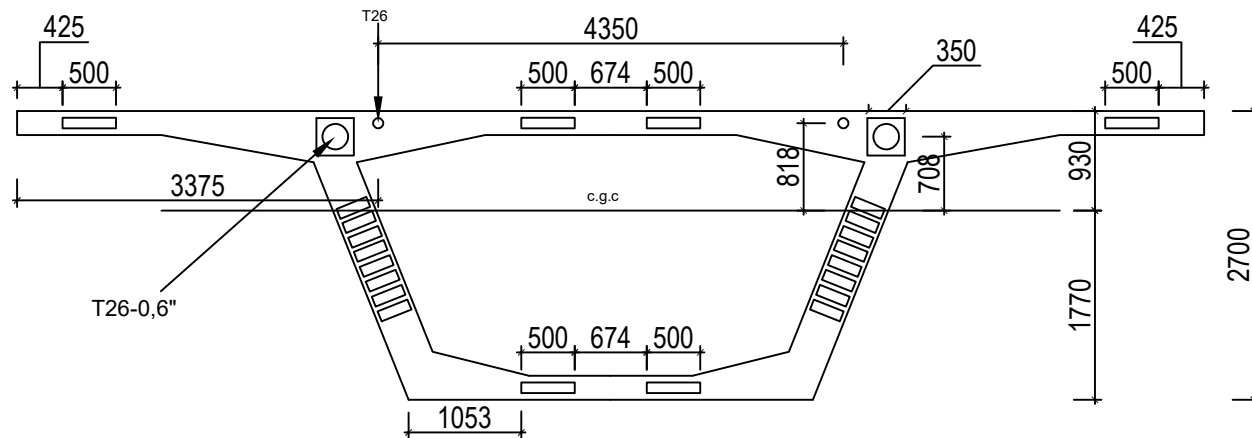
DETAIL BOX GIRDER SEGMENT 6 & 6L (S6 & S6L)
